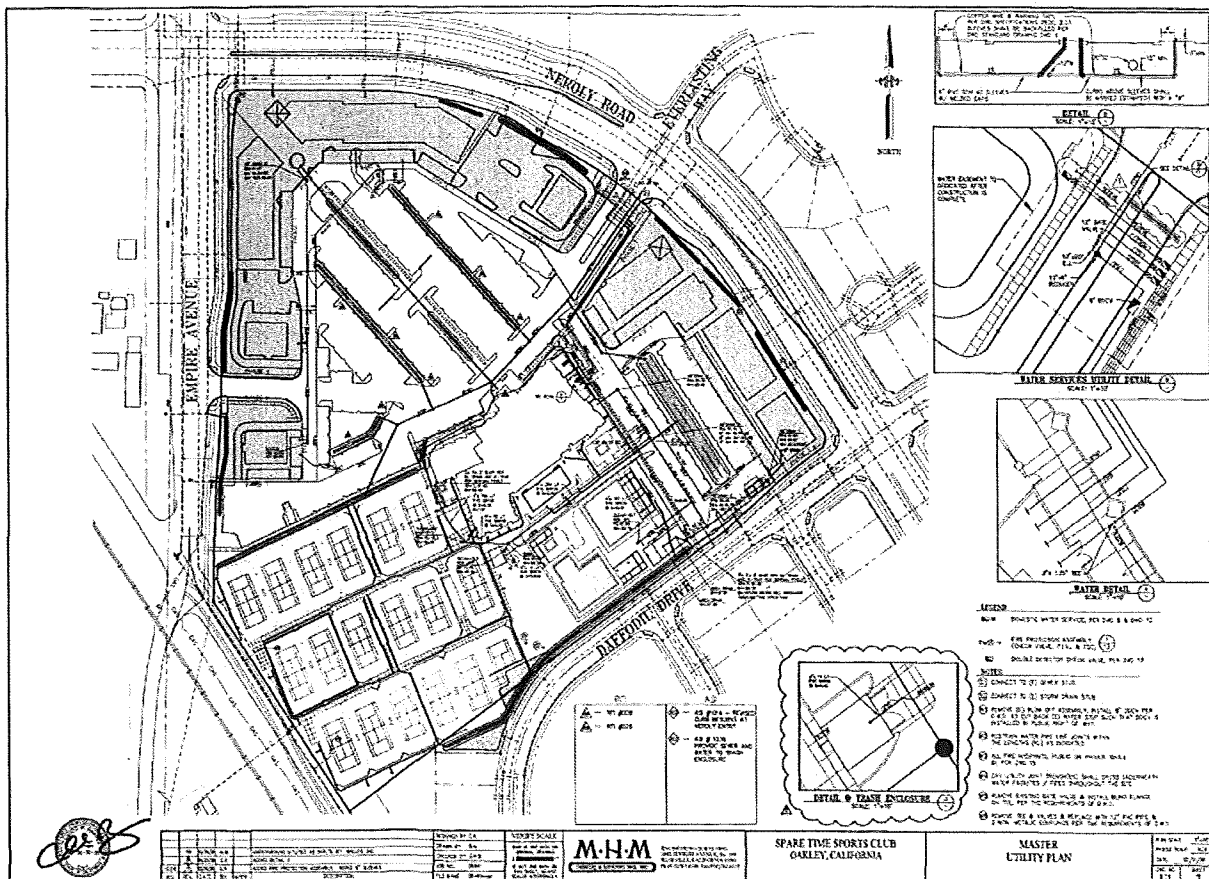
EXHIBIT B WATER, SEWER AND STORM DRAIN INFORMATION
